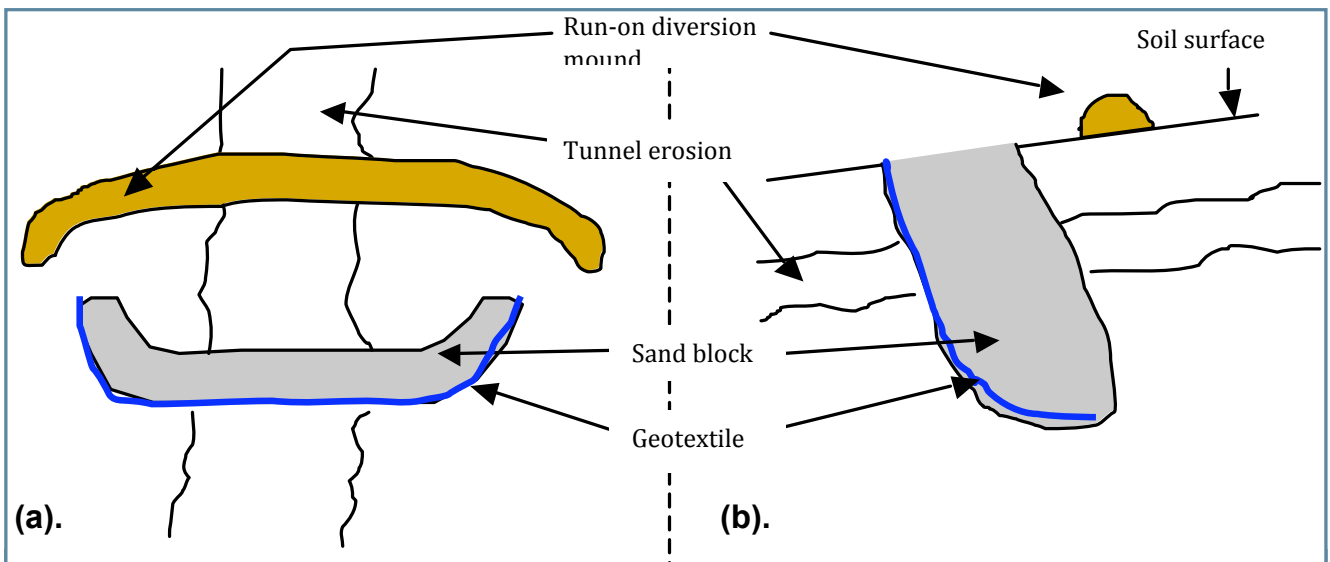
Modified sand block design. (a) plan view, (b) cross section view. The depth of the sand block is determined by the depth of dispersive soils or tunnel erosion. The span length of the structure is determined by the width of the tunnelling.
